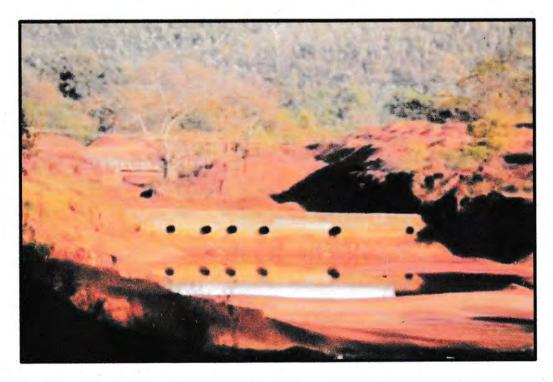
Constructed Boulder Wall at OT Hill Waste Dump Area
